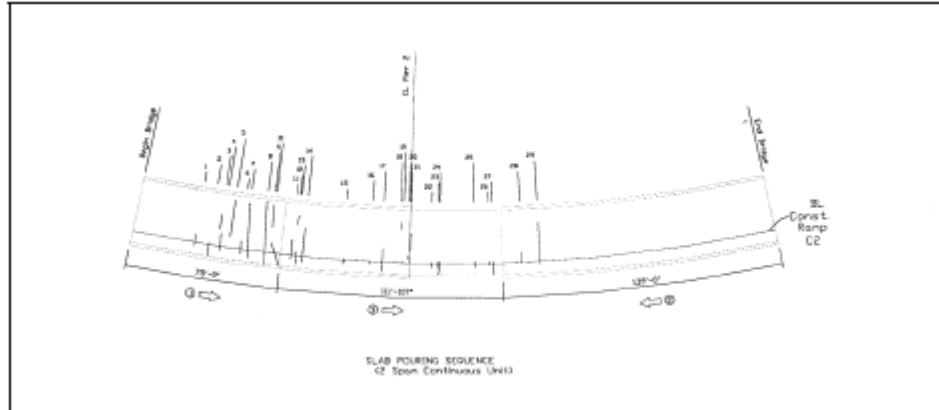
Full Sections of Bridge 705 and its Cracking Pattern
